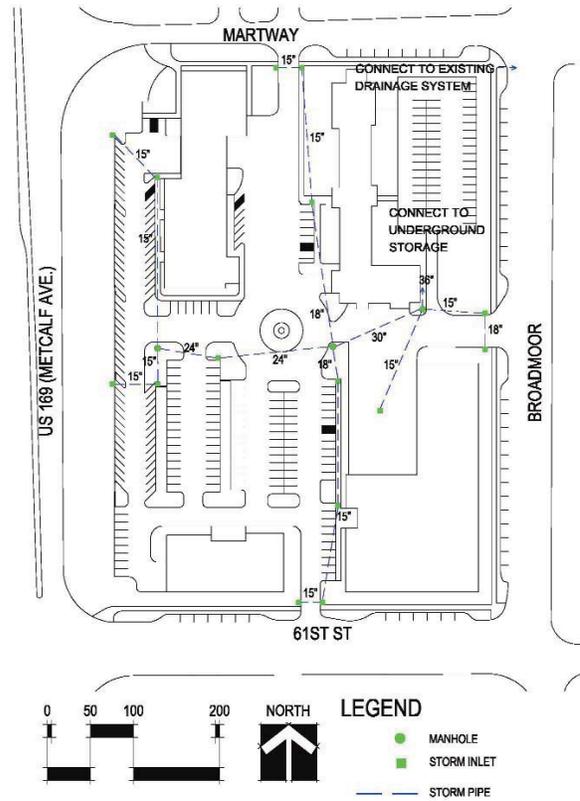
Metcalf Avenue Mixed-Use Development: Traditional Site Layout
